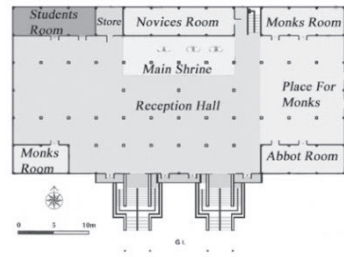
First Floor Plan of Bein-Daw Kyaung^{*16}
